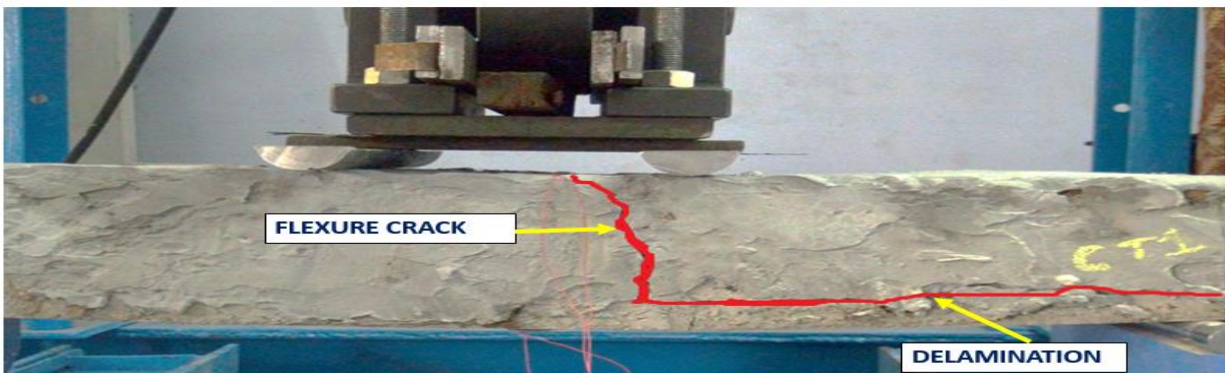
Delamination of tension strengthened masonry beam with cement mortar as bonding agent
